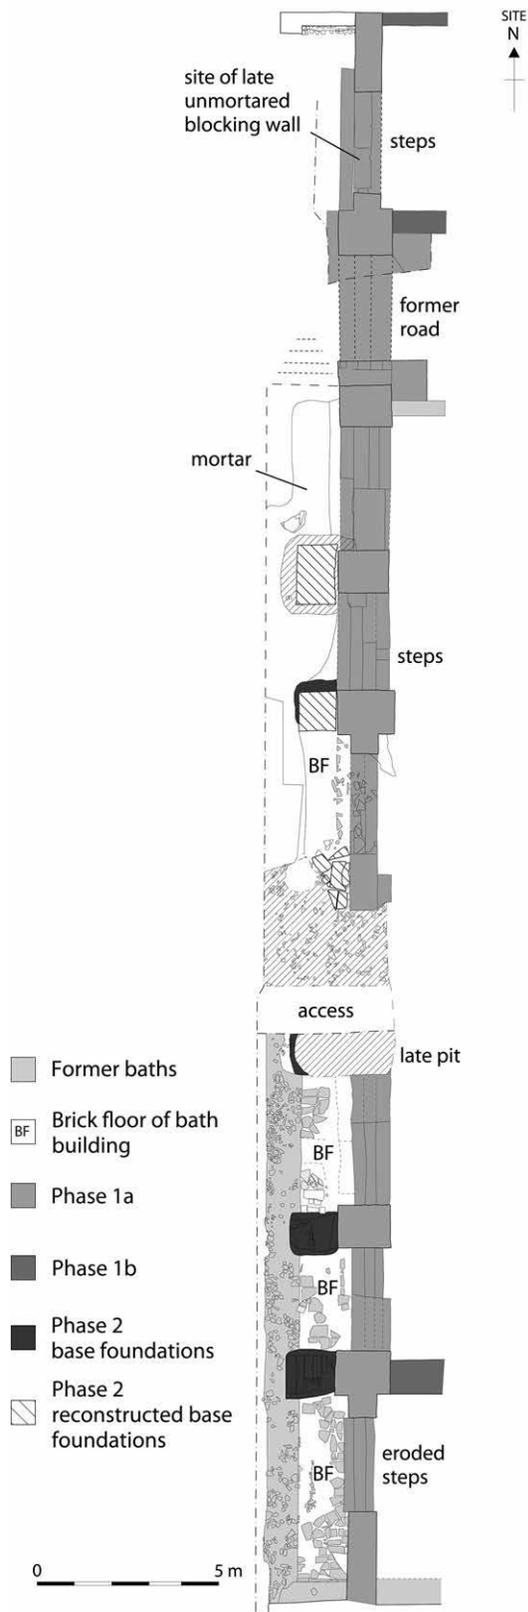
Facade trench phase plan of the Foro della Statua Eroica, showing Decumanus piers and surviving steps (drawing by K. Madigan, L. Bosworth, E. Boast, and D. Underwood).
